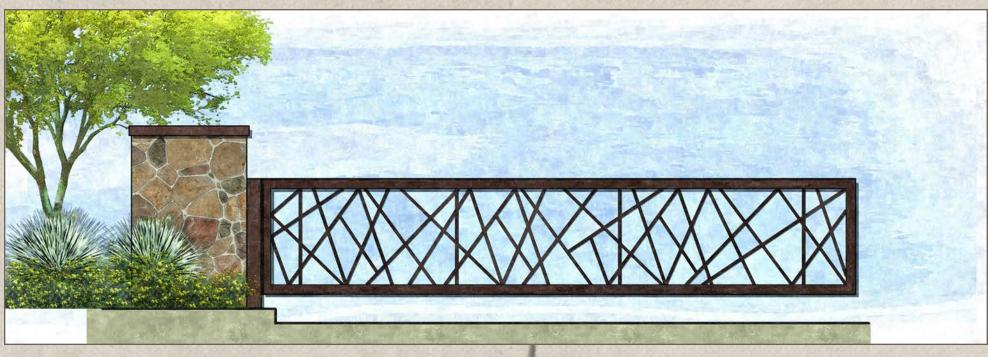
NEIGHBORHOOD ENTRY GATE - CONCEPTUAL ELEVATION #2
